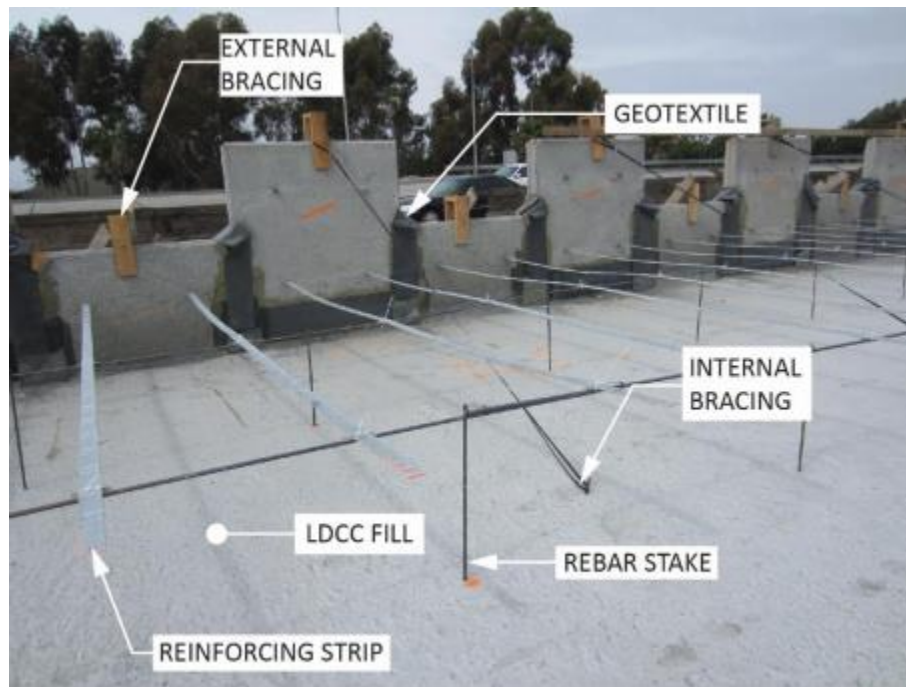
Example of support for steel strip reinforcements for an MSE wall constructed using LCC (Deni and Gladstone 2019).
